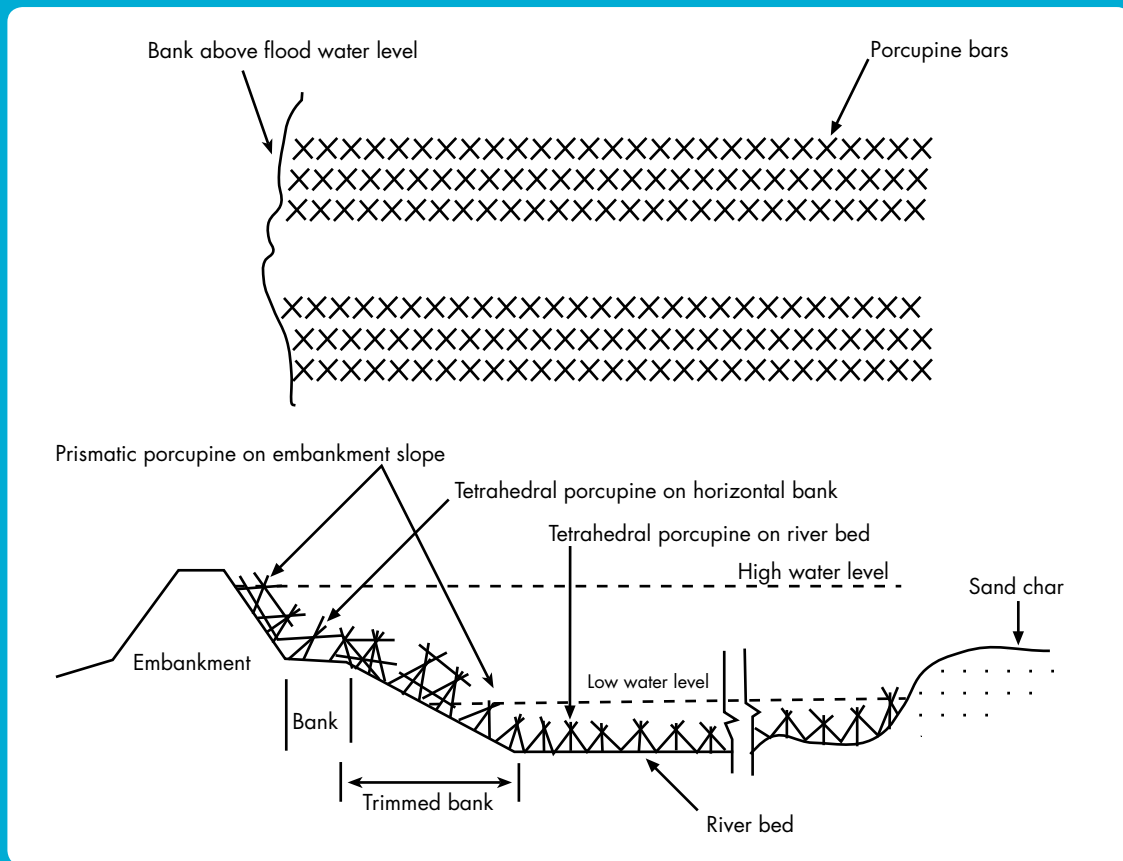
Plan (above) and cross-section (below) of a porcupine bar for embankment protection
